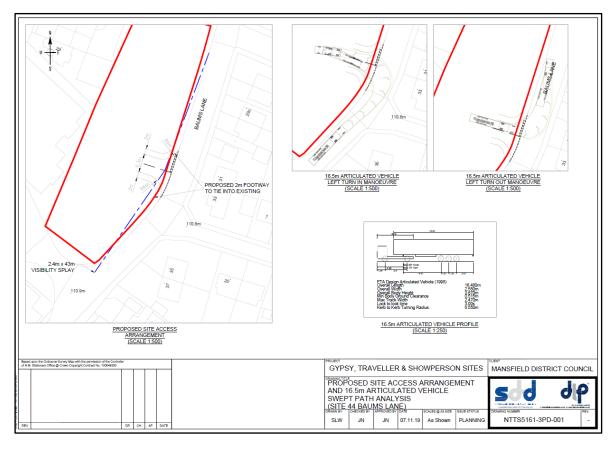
Baums Lane, Mansfield – Access Geometry, Visibility and HGV Swept Paths Site 84 – Lorry Park, Sheepbridge Lane
